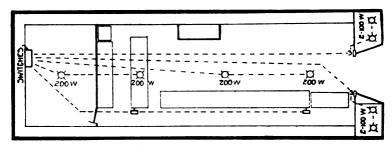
Figure B: This plan shows the lighting installation for a store 15 feet wide and 12 feet high. It calls for only one row of lights
